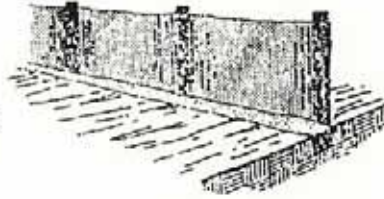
Constructing a silt fence to slow runoff and prevent erosion.
